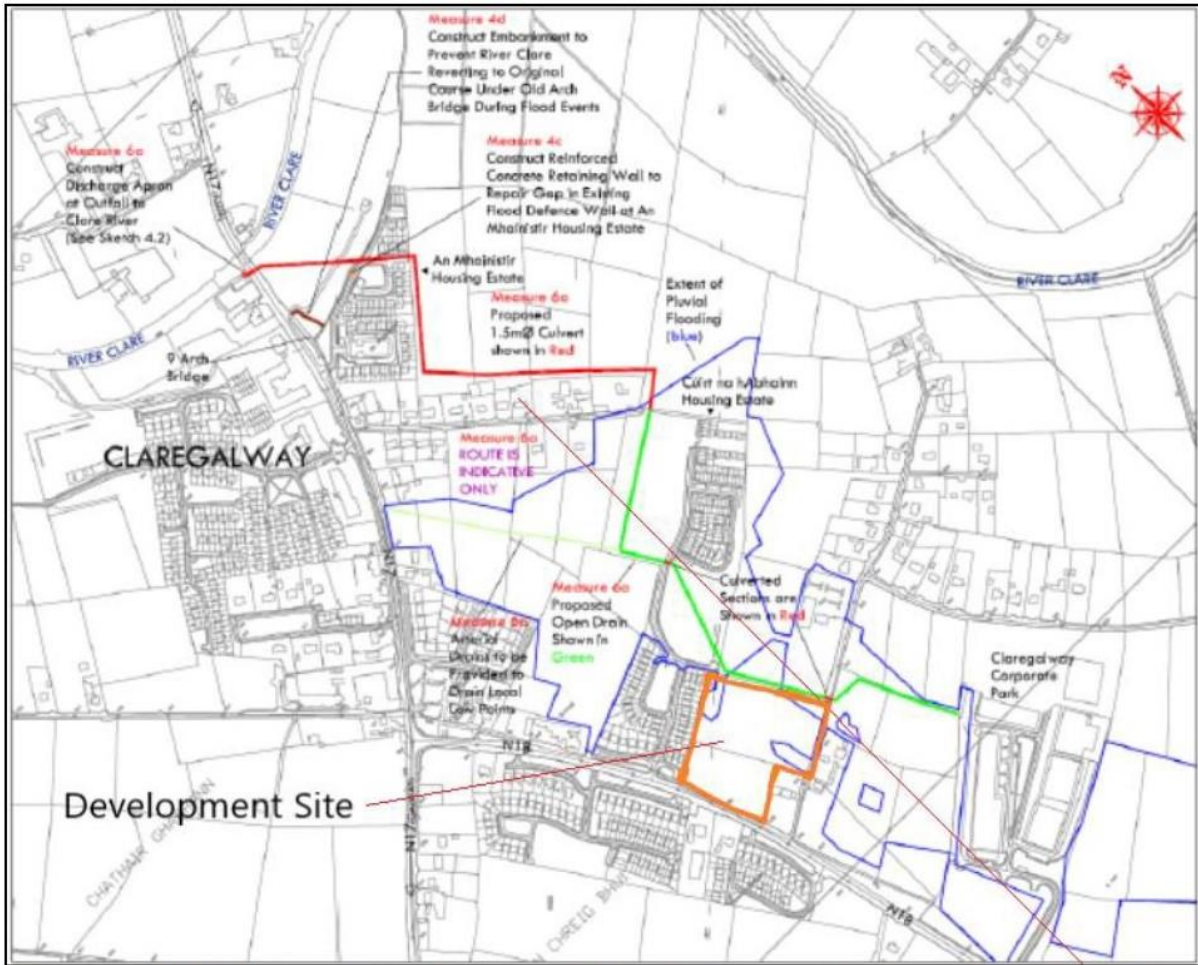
Clare Flood Relief Scheme Pipeline (In green) located adjacent to Development Site (In orange) (Image source JBA Consulting).
